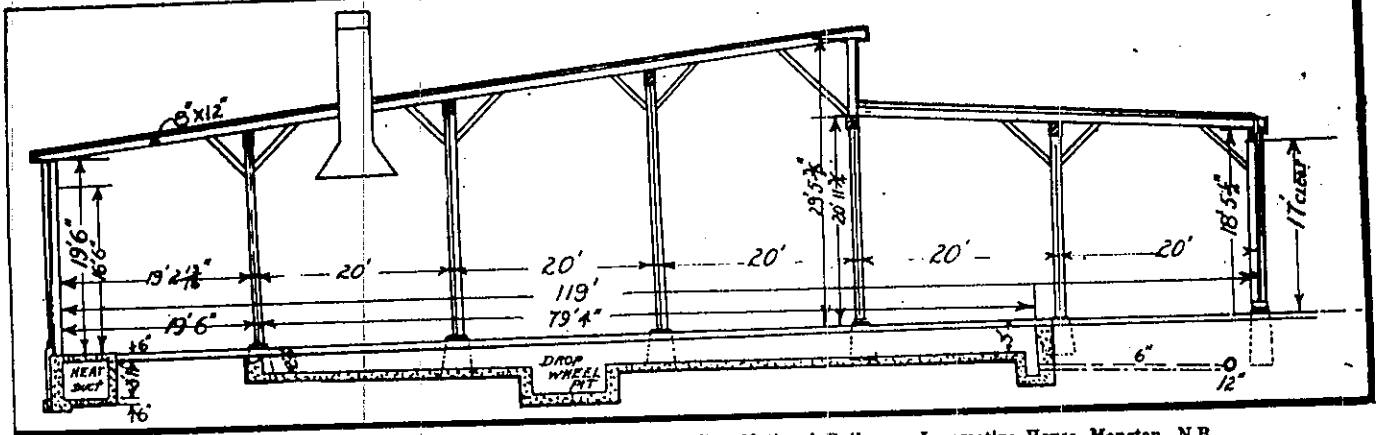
Cross section through drop wheel pit stall, Canadian National Railways, Locomotive House, Moncton, N.B.
